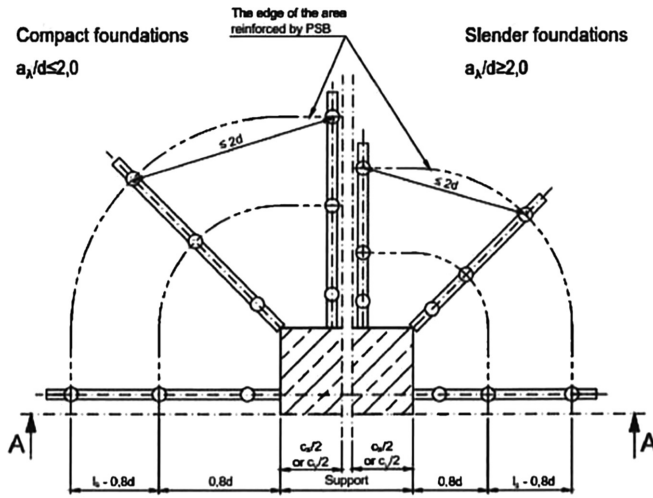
Maximum allowed spacing of studs in slender and compact footings (ETA 2018).
